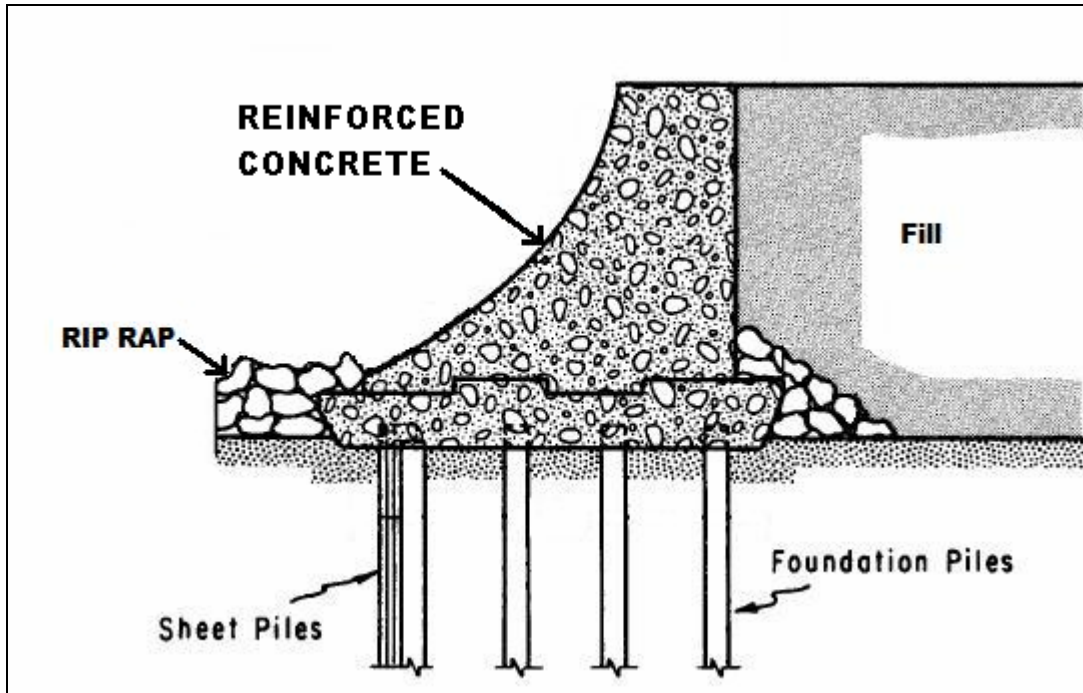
Pile supported, reinforced concrete curved face seawall, modified from Figure 6-1 SPM II, proposed east City Hall tsunami wall. NTS
